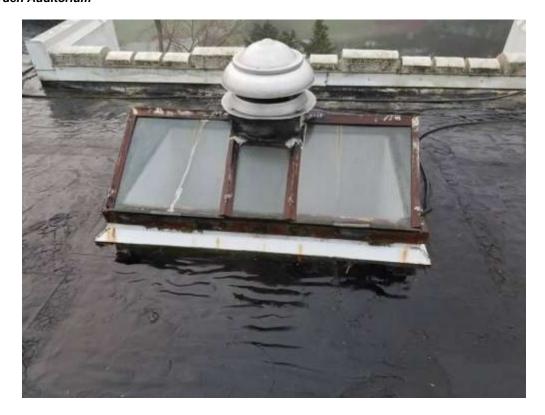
Asbestos-containing mastic on the skylight – upper roof, south section
